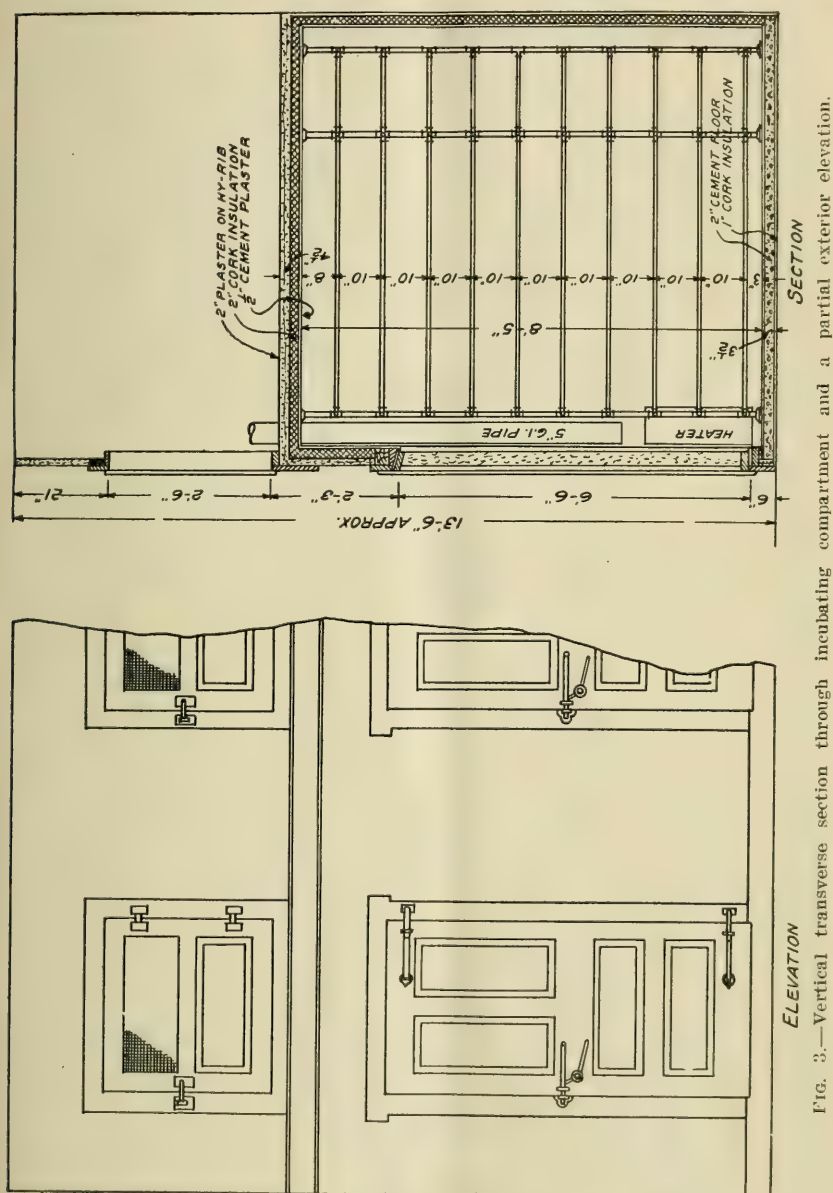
Vertical transverse section through incubating compartment and a partial exterior elevation.
